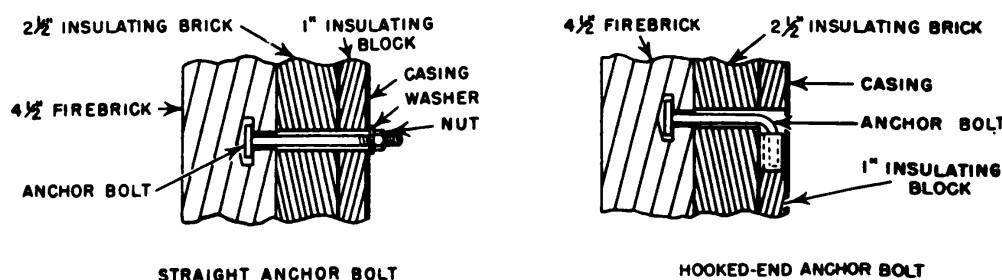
Use of straight and hooked-end anchor bolts in furnace construction.
